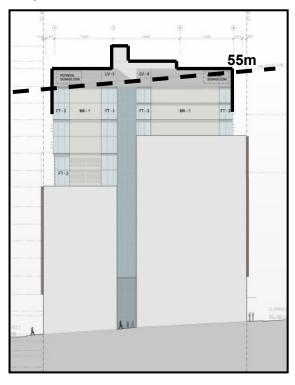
Section illustrating extent of building over 55m and setbacks at roof level
